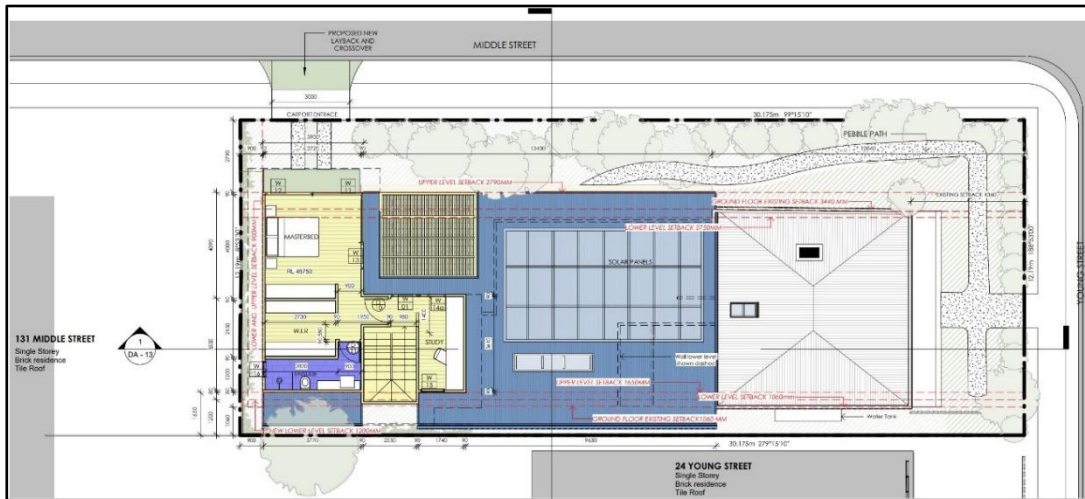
Proposed First Floor Plan. (Source: Bentley Design)
